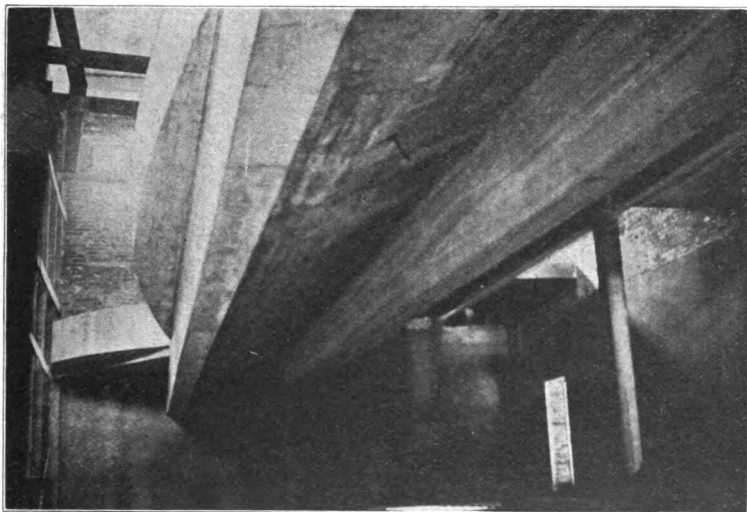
Balcony Girders of 61 feet span, College of Music. Cincinnati, O., One girder 2 feet 8 inches deep, one Girder 3 feet 2 inches deep.
